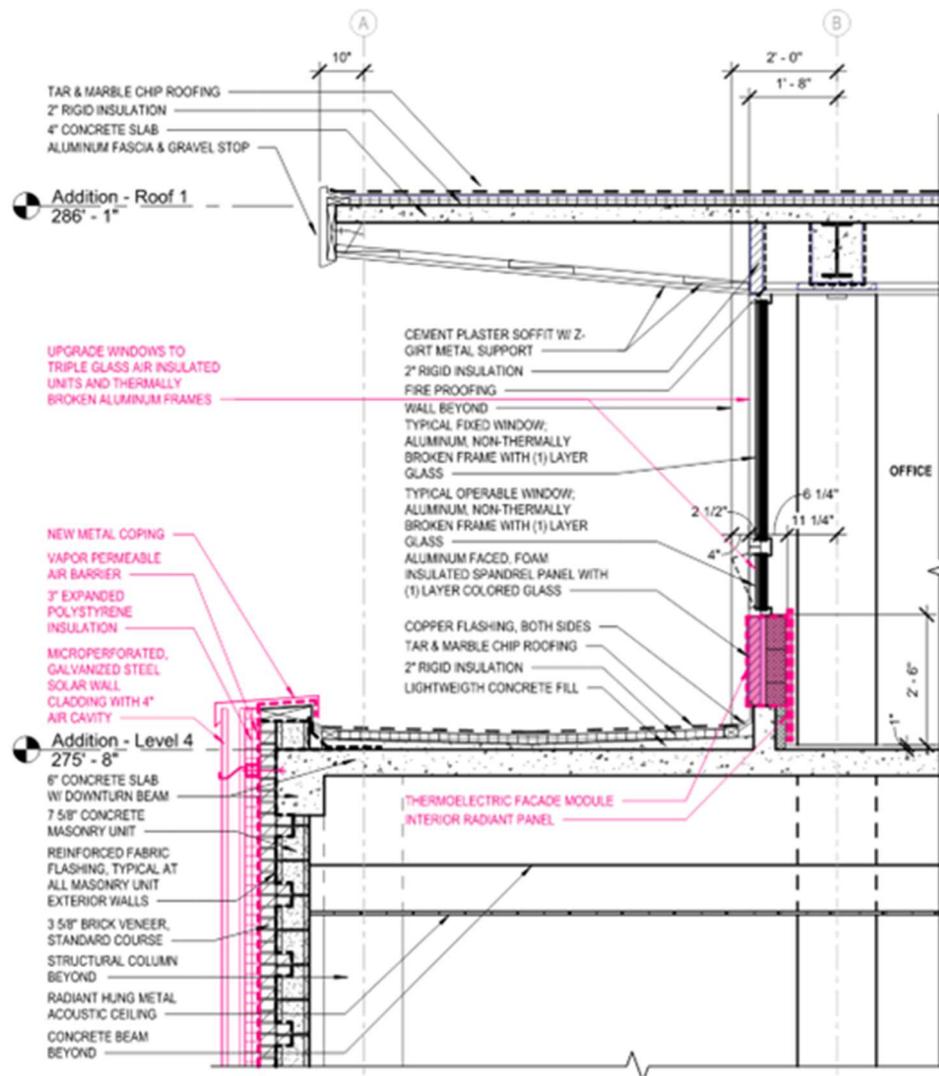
Typical exterior wall for the addition building, indicating existing facade components (in black) and retrofit design strategies (in color) (Source: Author [12]).
